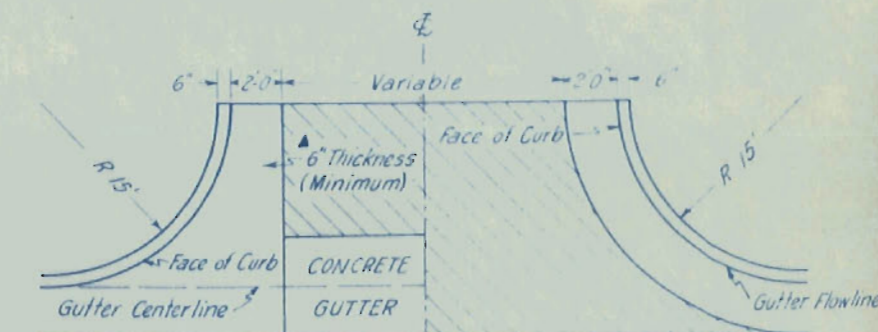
DETAILS OF CURB CUTS WITHOUT SIDEWALK
